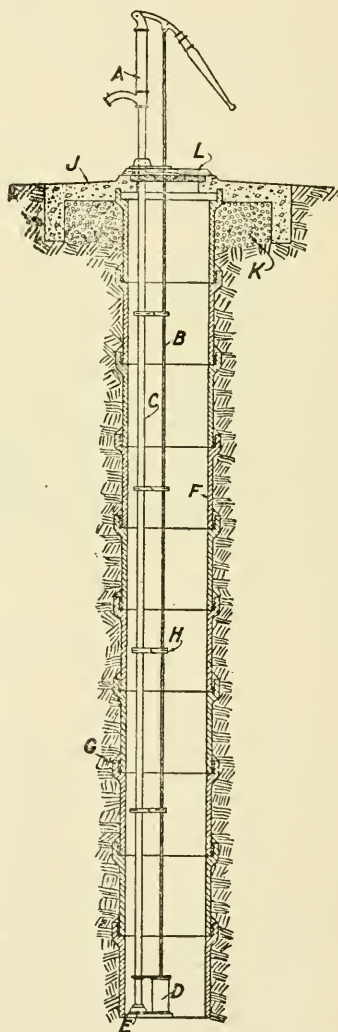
Section of a dug well with pump showing proper type of casing and protection about the top. Curbed with vitrified socket pipe. (a) Pump stand; (b) pump rod; (c) riser pipe; (d) cylinder; (e) check valve; (f) vitrified socket pipe; (g) joints packed with a strand of oakum dipped in grout and filled with cement mortar; (h) pump rod guides; (j) platform; (k) gravel foundation; (l) cross-planked cover.
